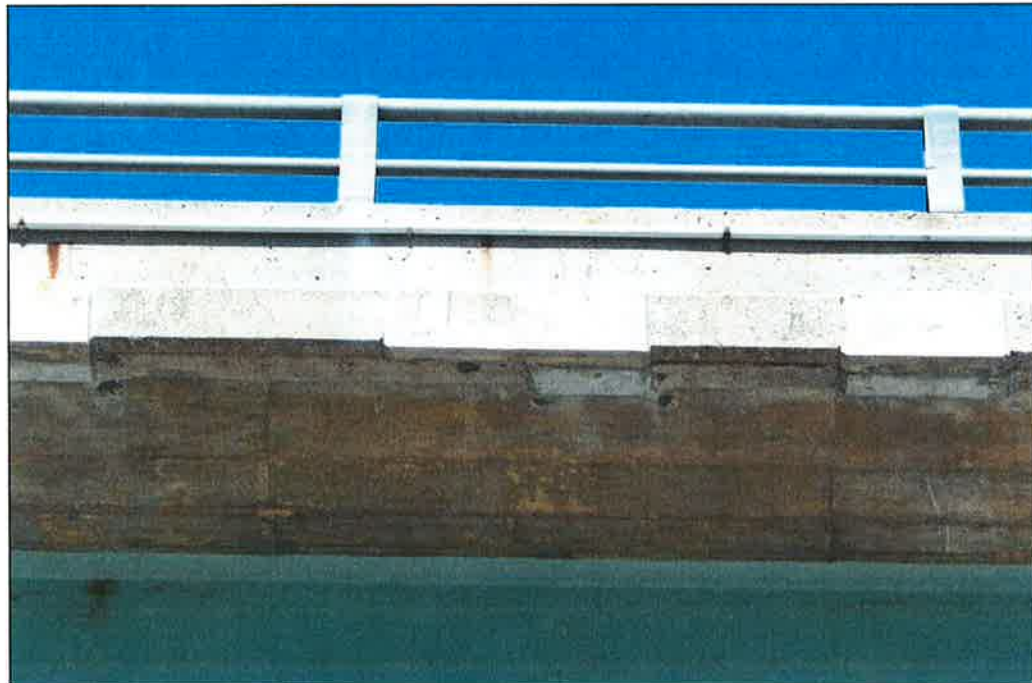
Typical Condition of Fascia (Bent 91-92) (fair condition – cracking, isolated spalls and patches)
